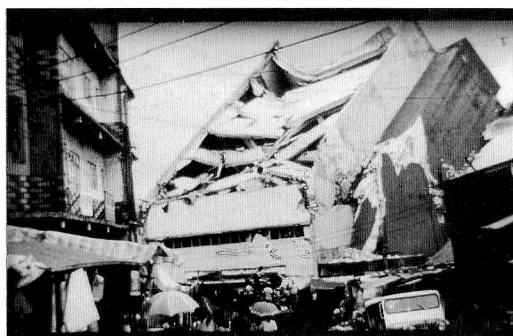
(b) BAGUIO HILLTOP HOTEL (north
